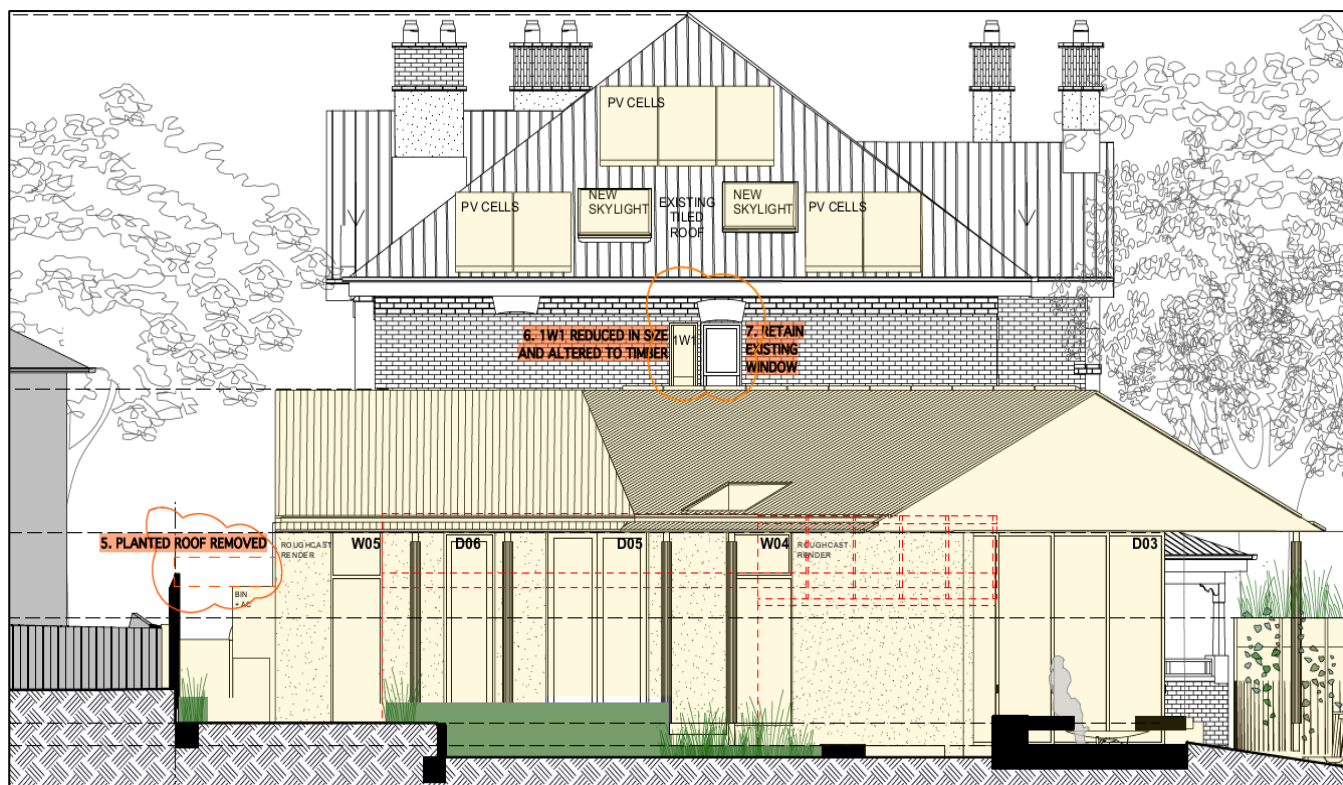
Extract of the applicant's submitted amended East Elevation.
